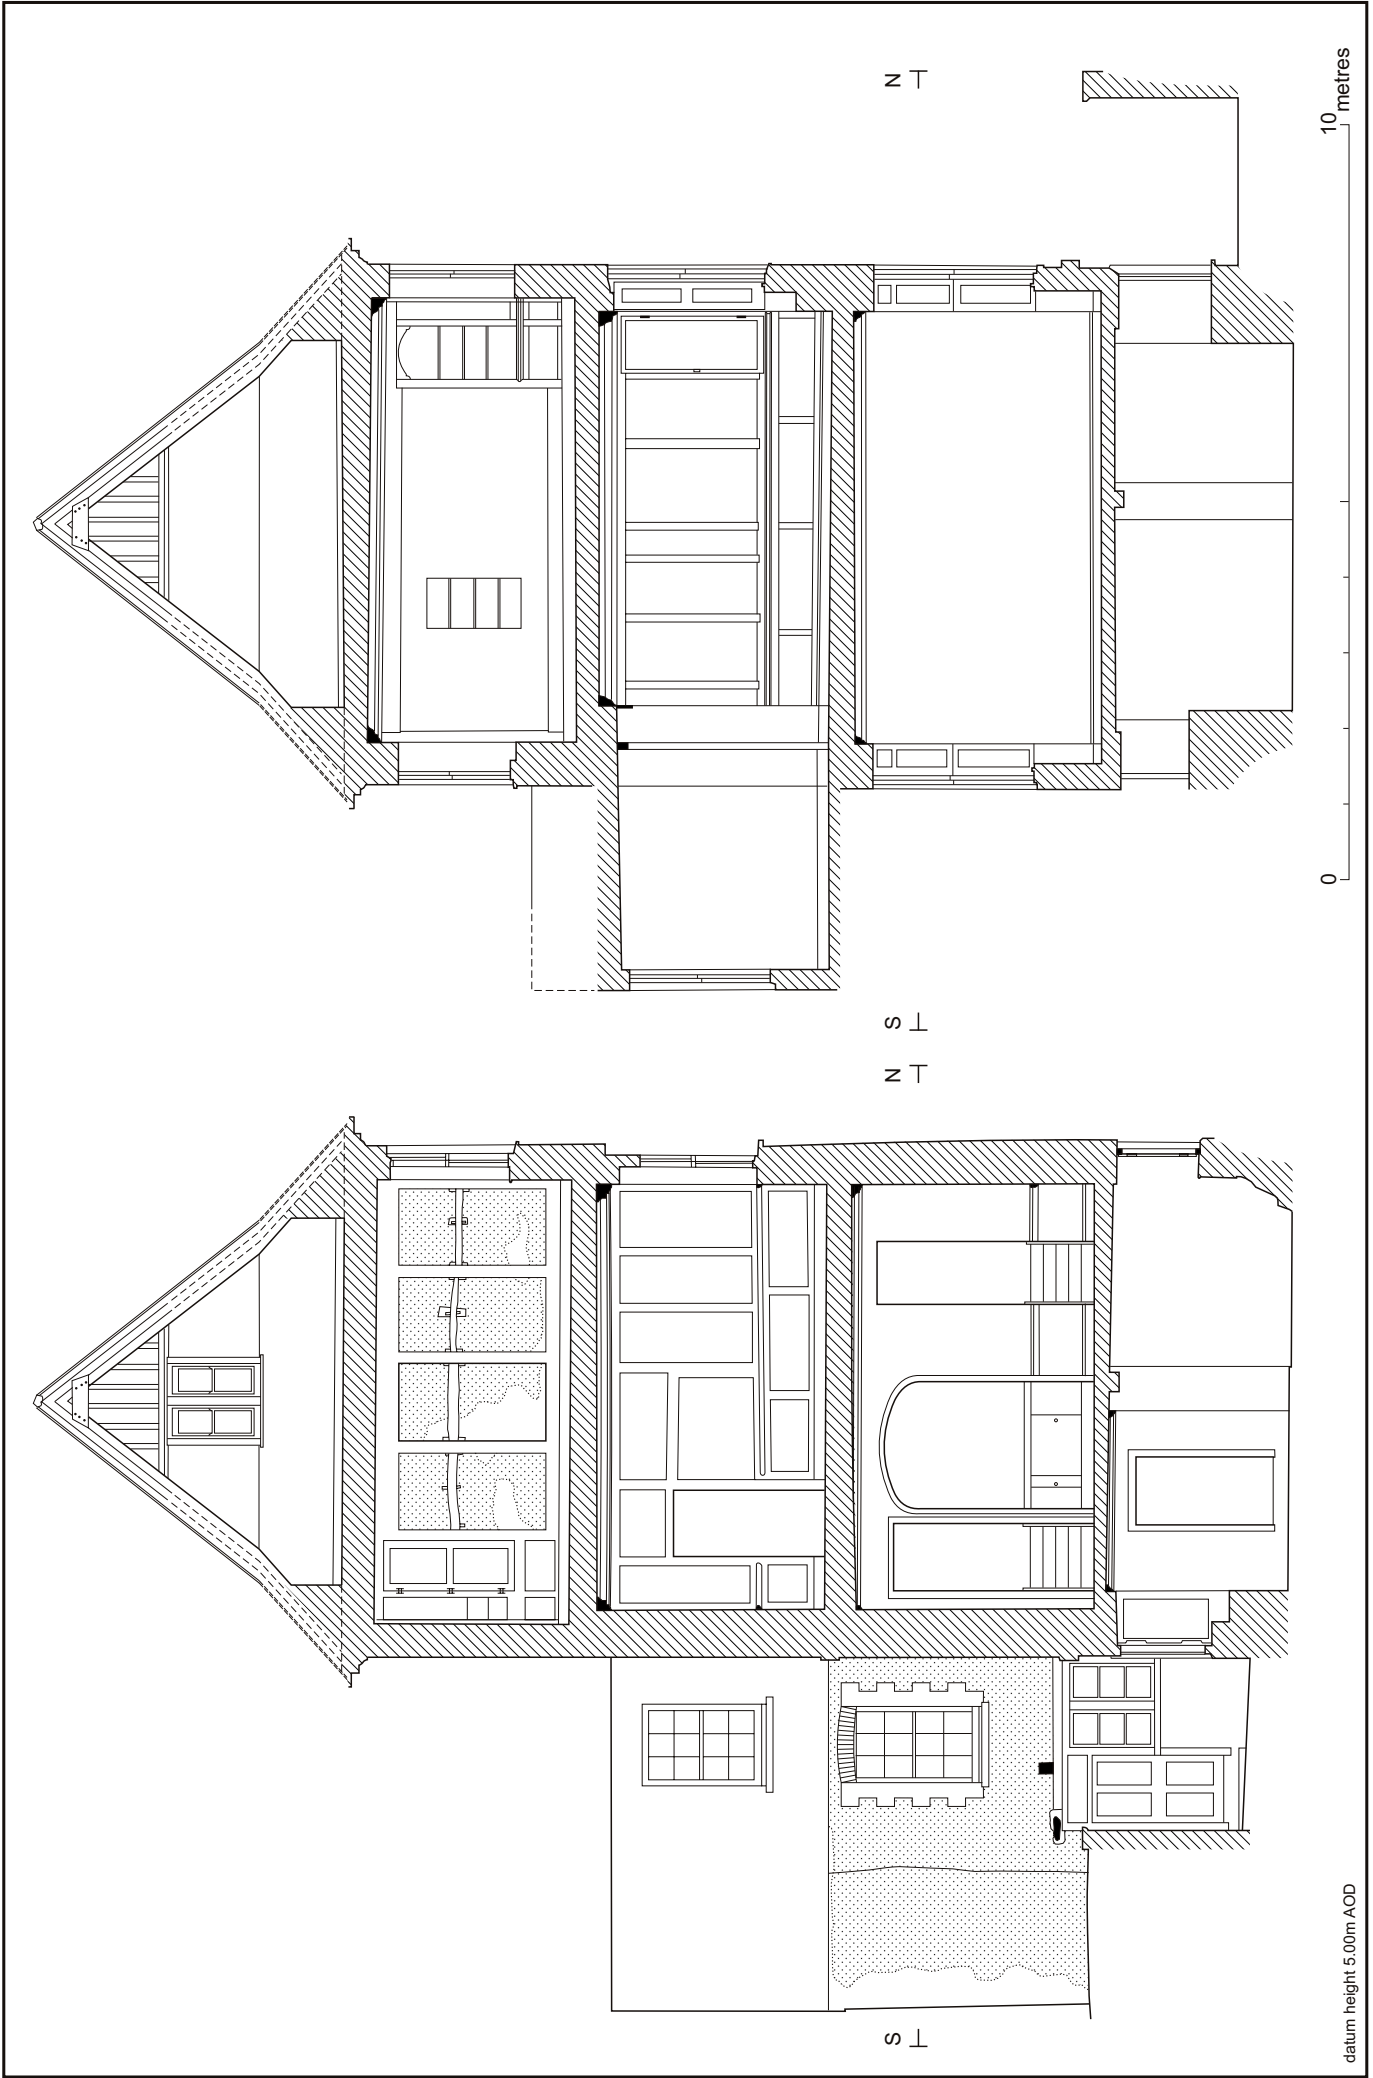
Sections of the Notaries House looking south-east and north-west. Scale 1:100.
